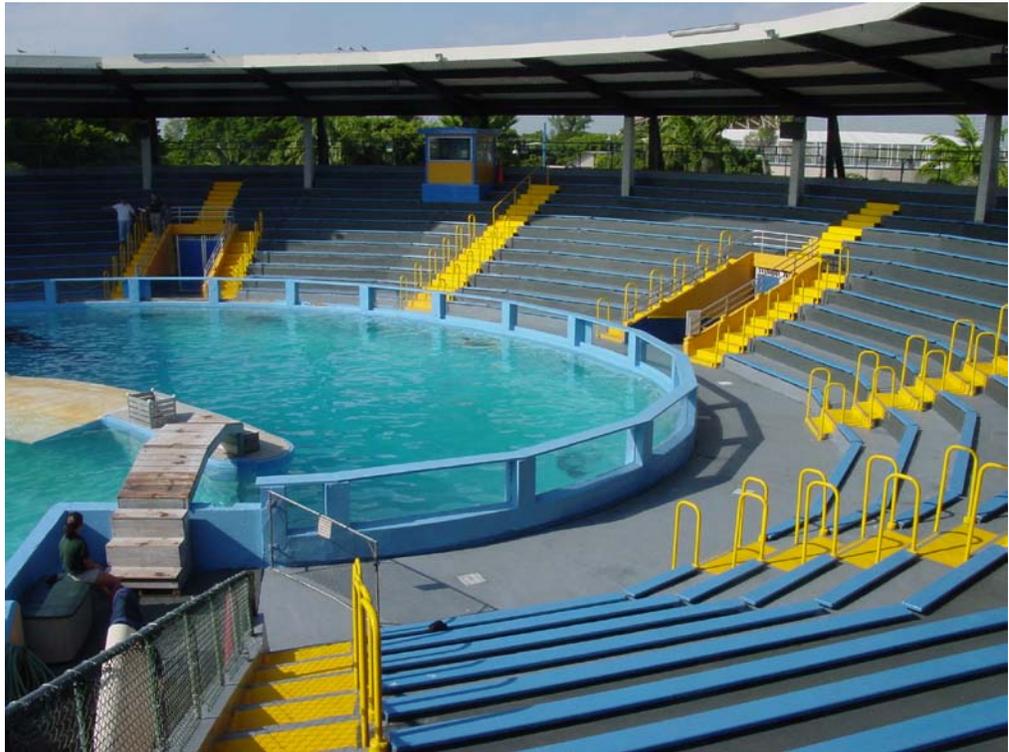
Versaflex Project – Finished Installation of Polyurea Coating at Killer Whales Tank
